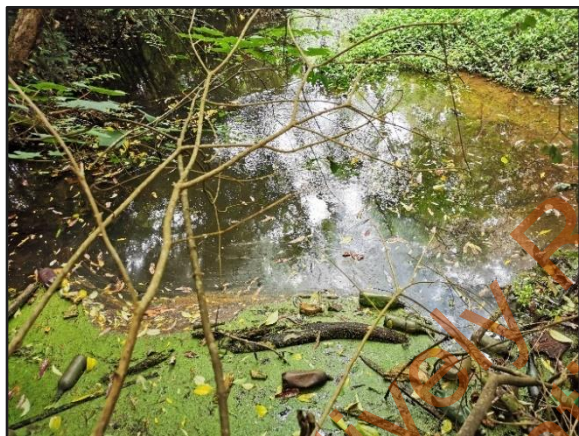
Downstream Culvert 2. Pooled water and debris visible.
